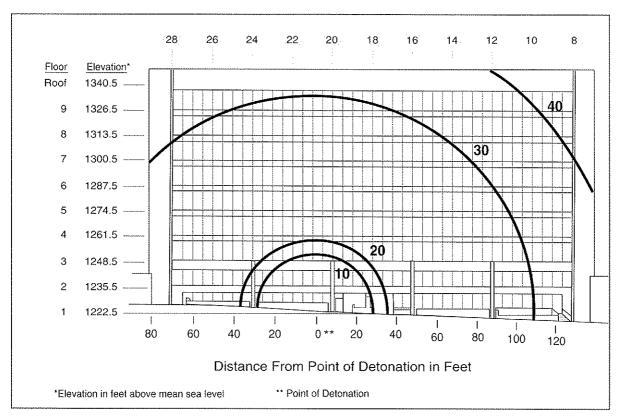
Duration of loading (in milliseconds) on north elevation of nine-story portion of Murrah Building.
